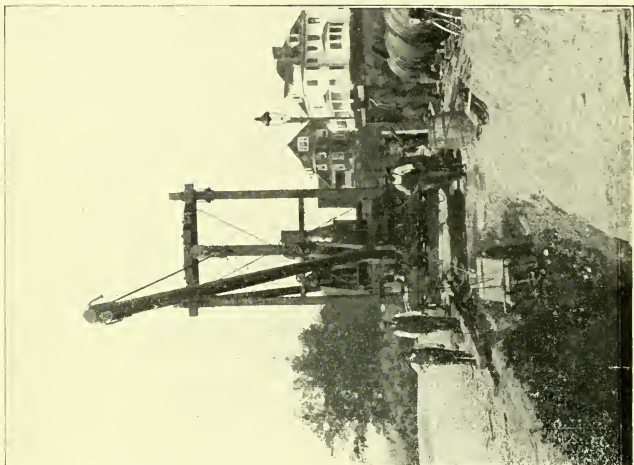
BYER TRENCH MACHINE, USED ON SECTIONS 19 AND 24.
